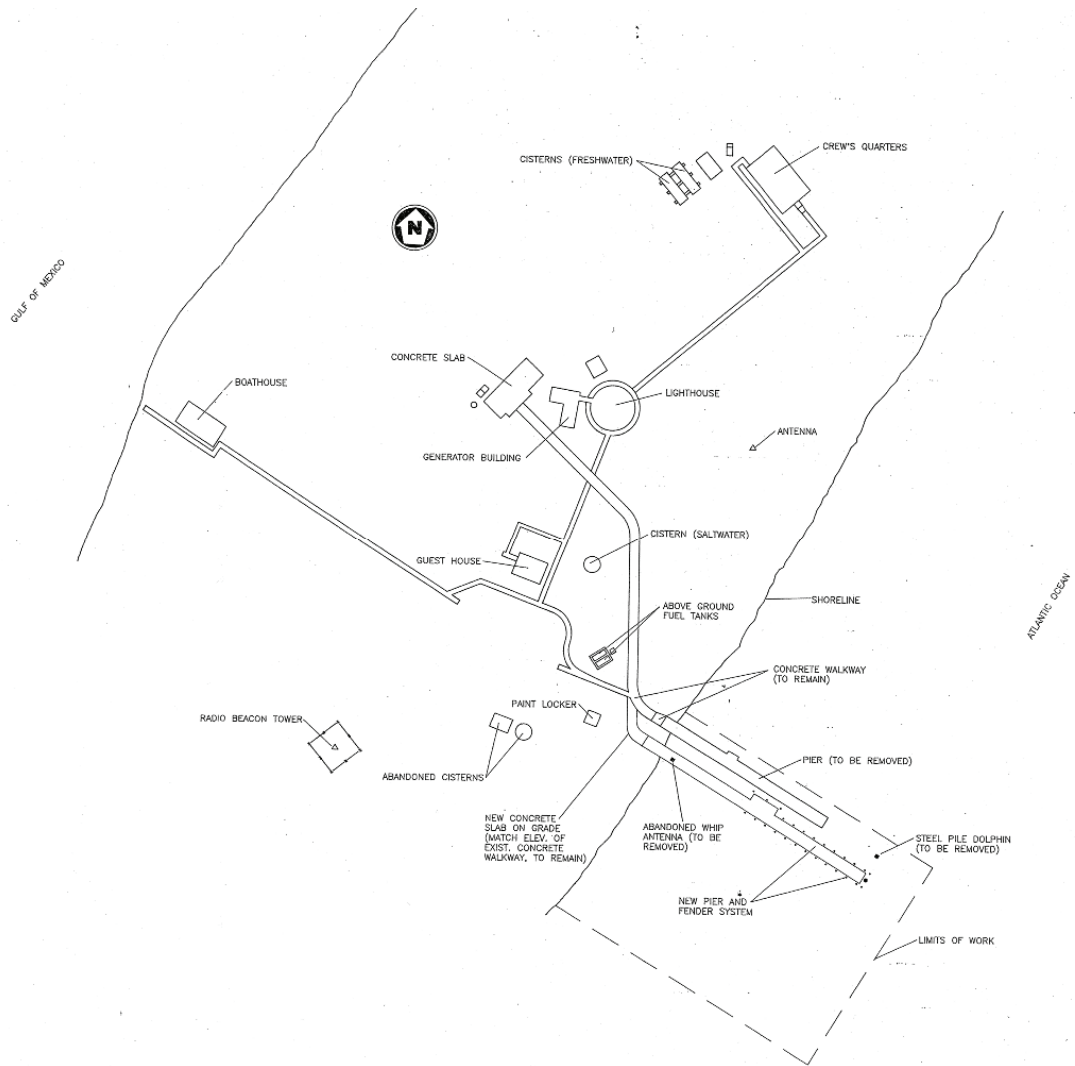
Close-up of 1993 "General Plot Plan" to "Replace Pier."
